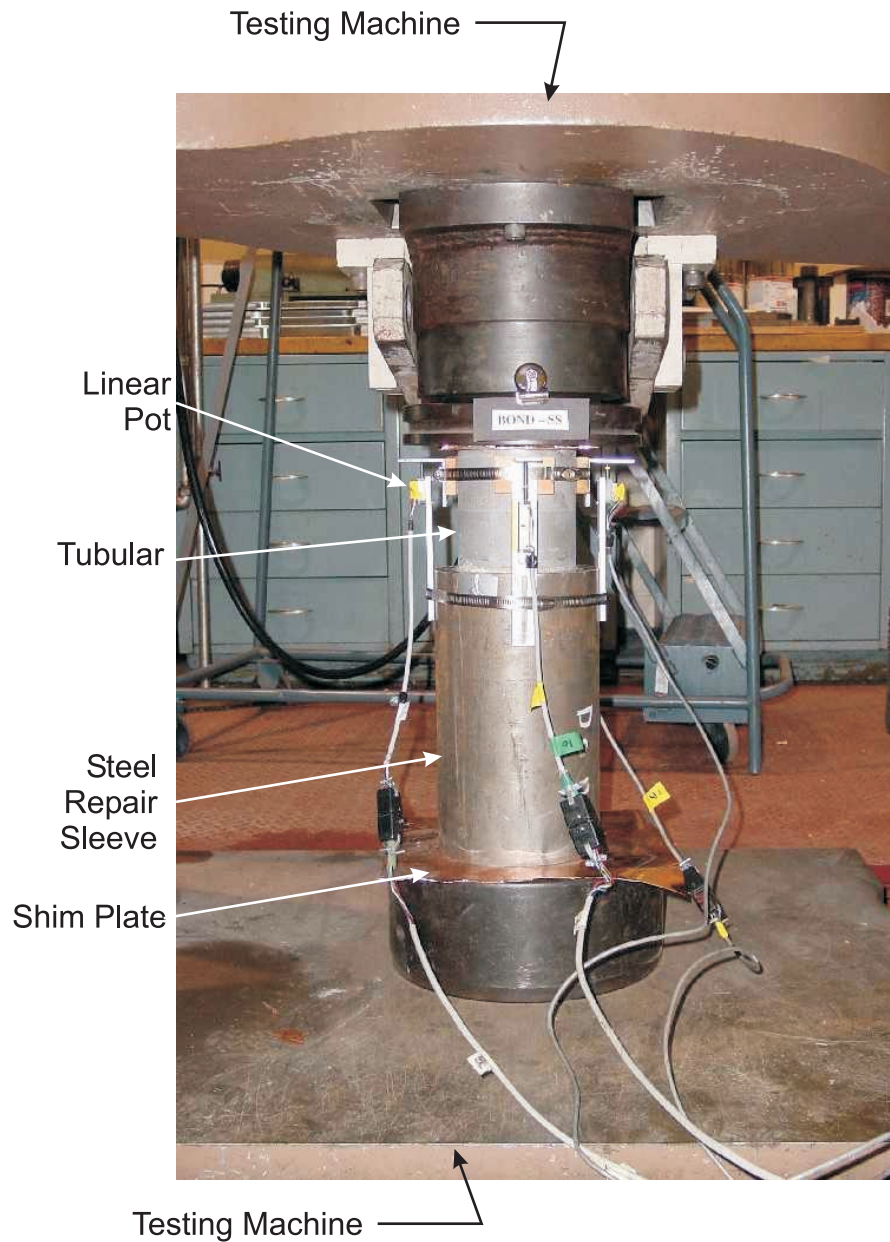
Photo of Bond Test Specimen in Testing Machine (Three of Four Linear Pots Shown)
